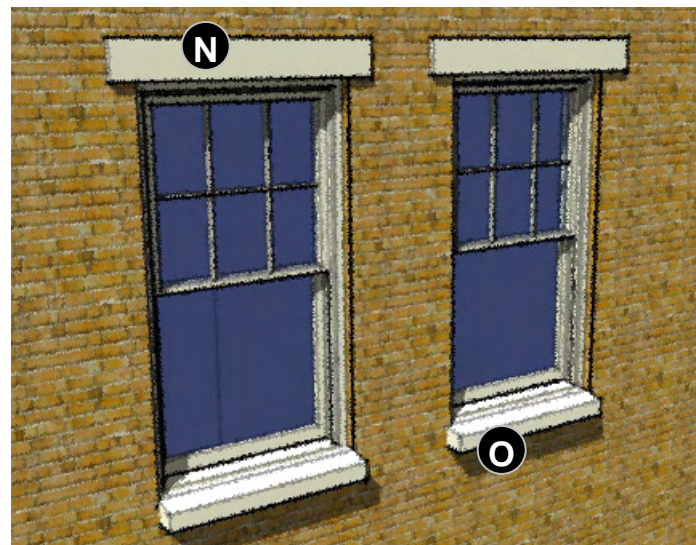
Window and door openings in masonry facades are often best expressed with an exposed lintel over the opening which shows how it is carrying the weight above.
